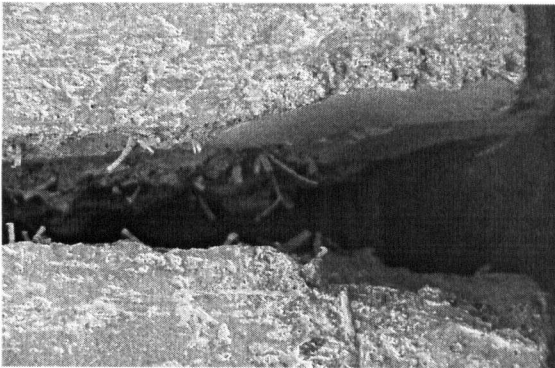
Broken Specimens of Steel Fiber Reinforced Concrete under Impact Loading, showing Fiber Pull-Out
